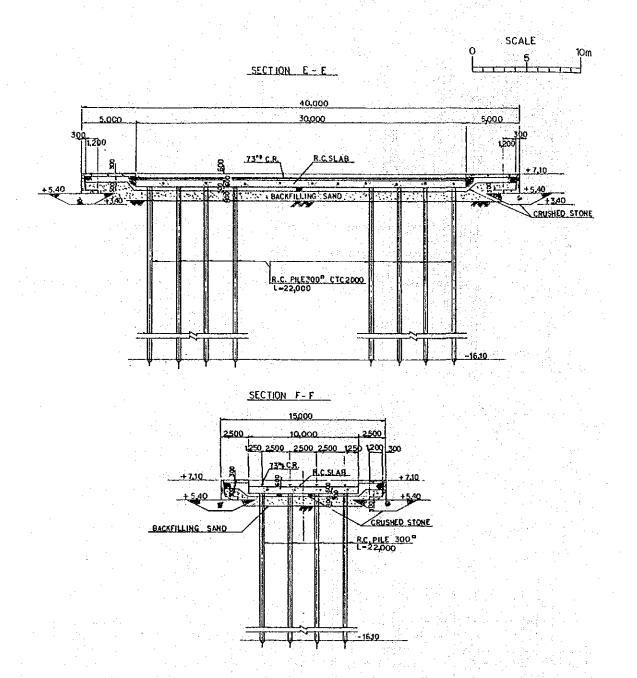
(3/3) Drawings of Slipway at the Phuket Mechanical Center
